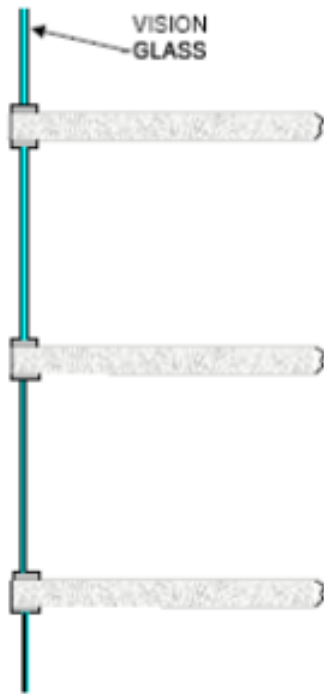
Curtain wall supported on slab edge. (Courtesy of Aon Fire Protection Engineering)
